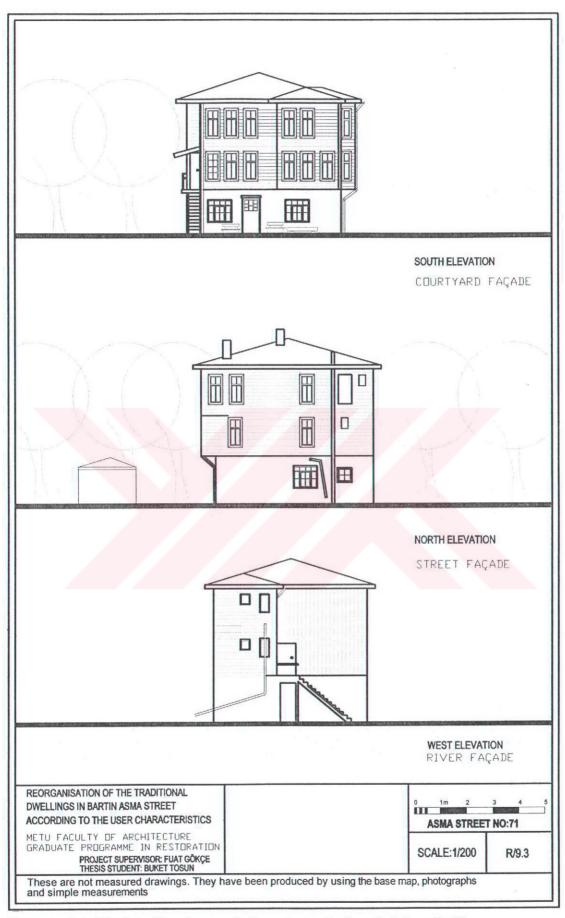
Sketch Drawings of Facades of the Building No:71
